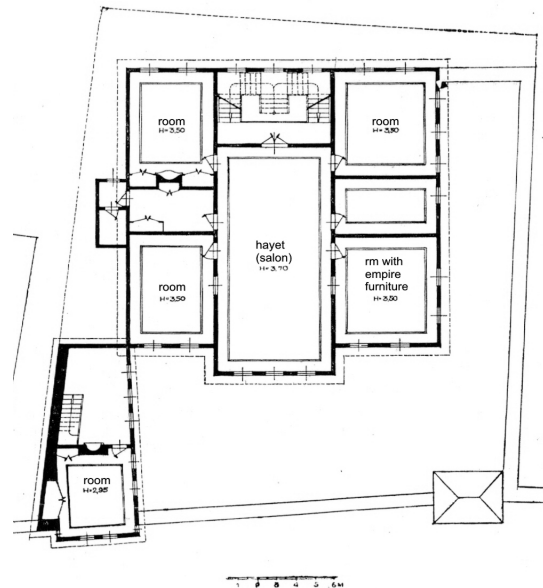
Second floor plan of Nedkovich house [2, 220].
